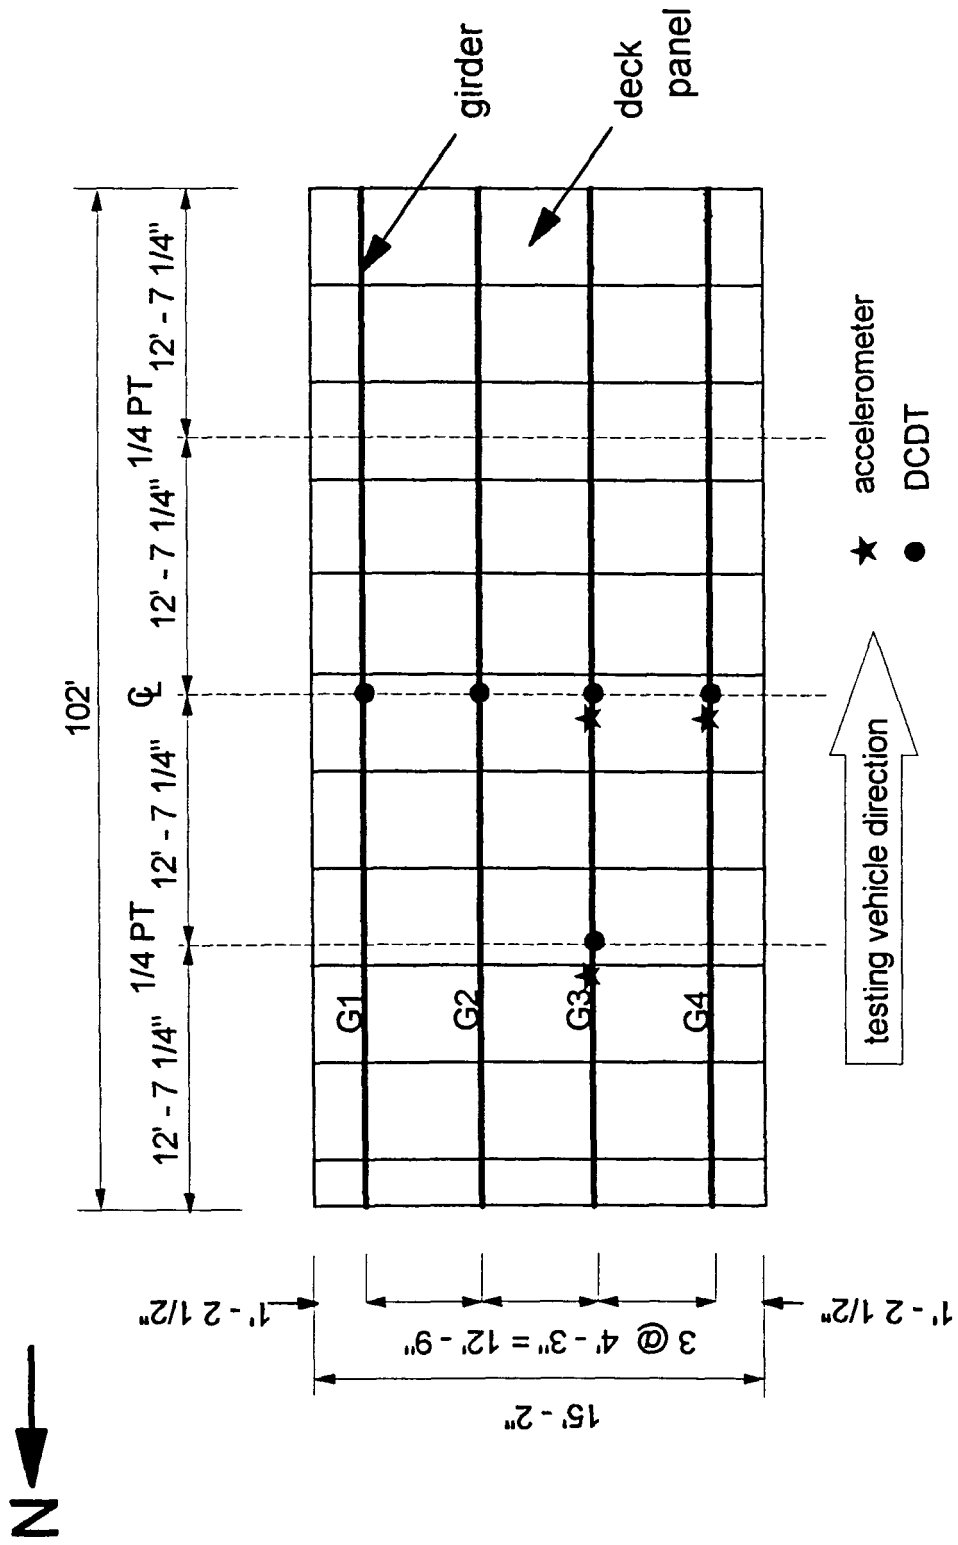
Layout and instrumentation on Span 3 of Wittson Bridge
